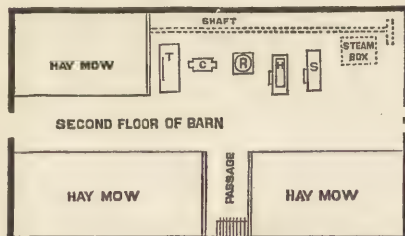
Plan of Second Floor of Main Barn—T, threshing machine—C, corn sheller—R, root cutter—H, hay cutter—S, stalk cutter.
